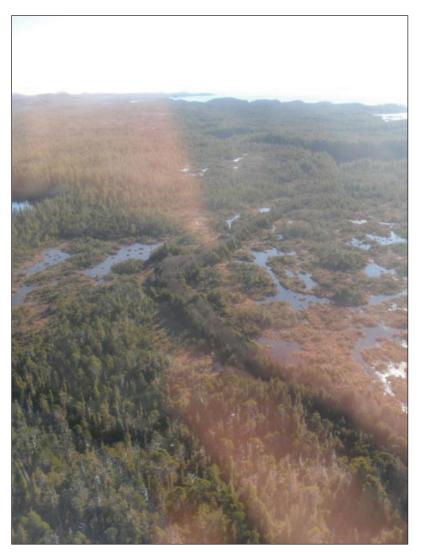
Existing Road to Tel Deposit and Typical Banks Island Landscape, January 2011 Site Visit
